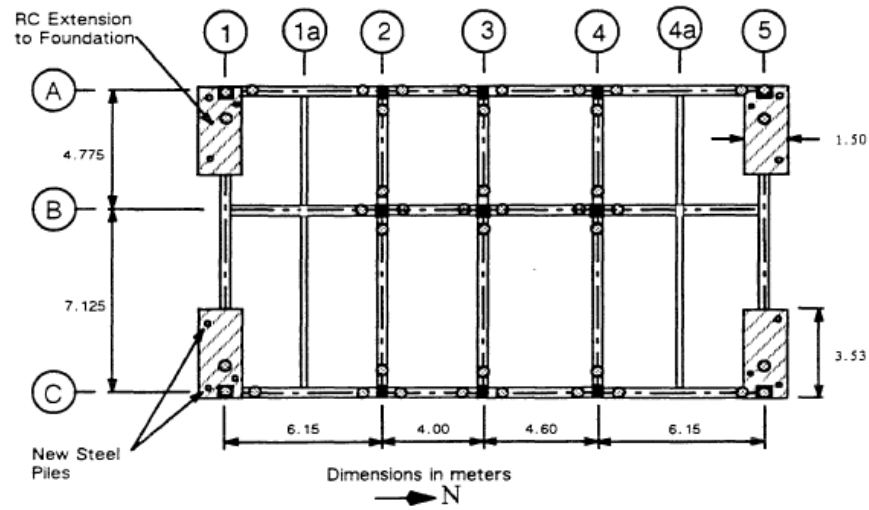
Foundation plan depicting retrofit elements (Downs, et al., 1991)
